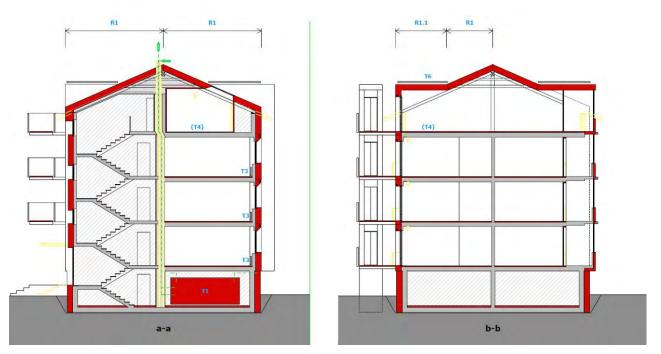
Cross-section with new building envelope as well as direct heated and indirect heated rooms (hatching)
